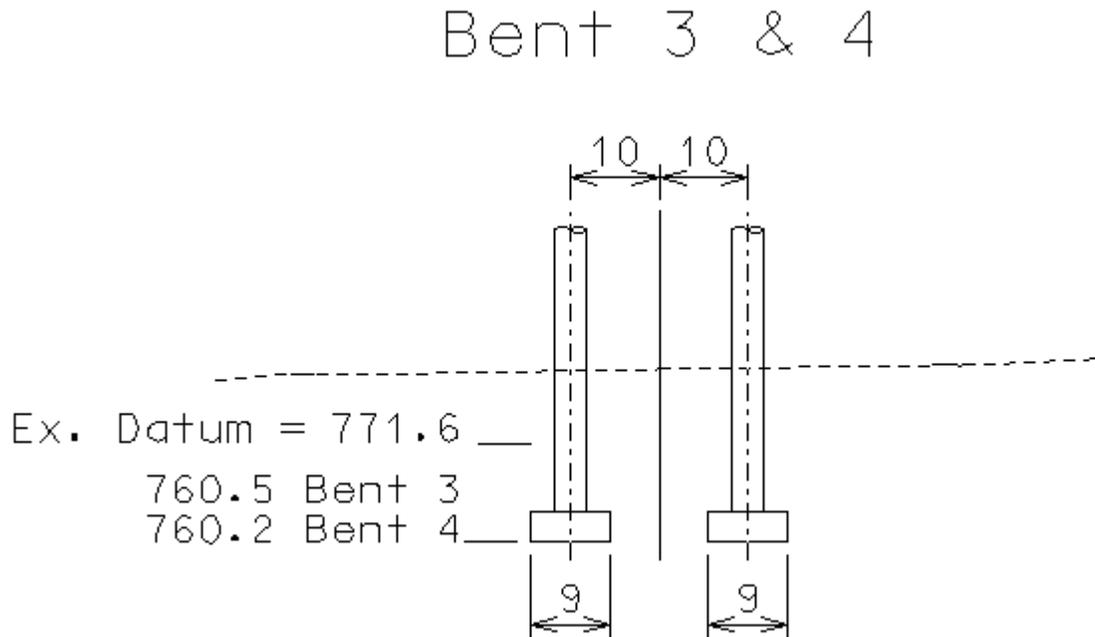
Excavation Limits: Stream Crossings (Typical)
